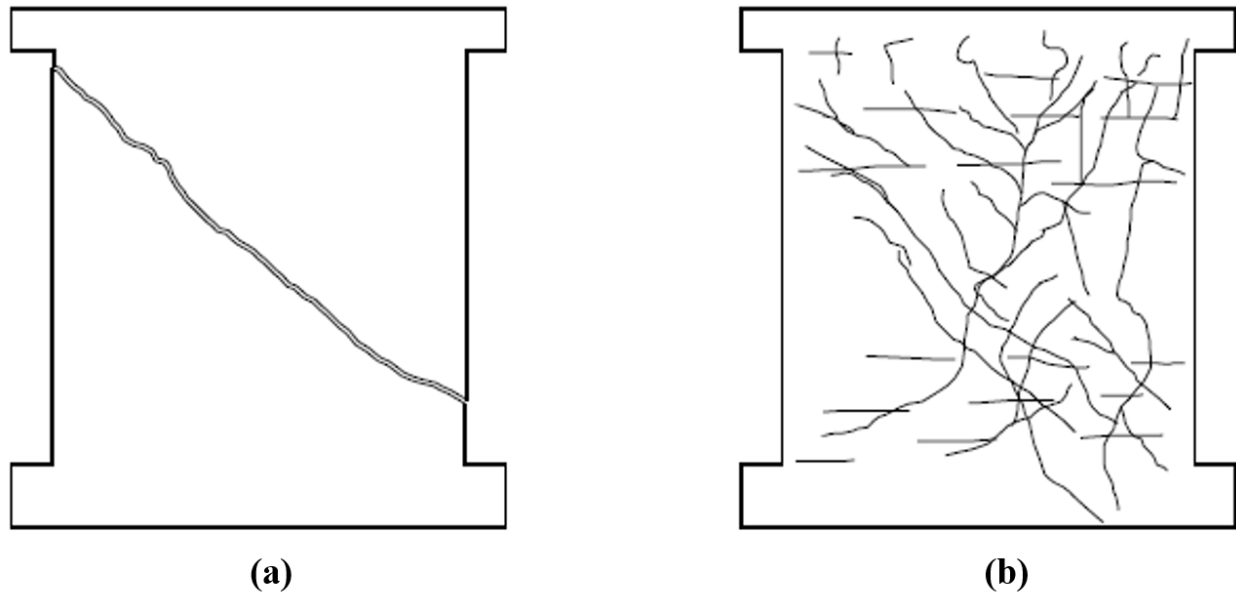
Cracking patterns associated with diagonal shear failure: (a) brittle failure and (b) ductile failure (adapted from Voon, 2007)
